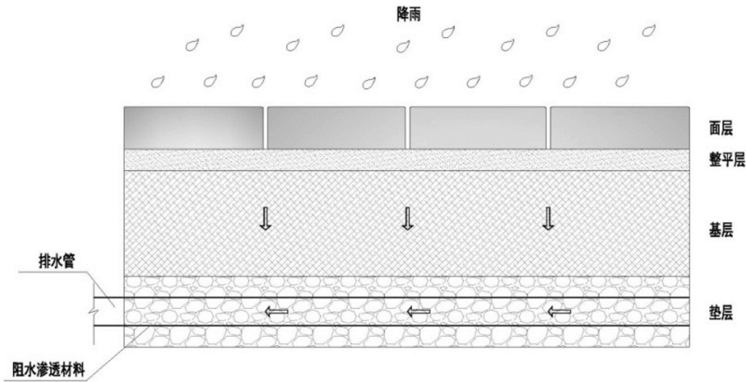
The schematic diagram of “Half permeable” sidewalks
